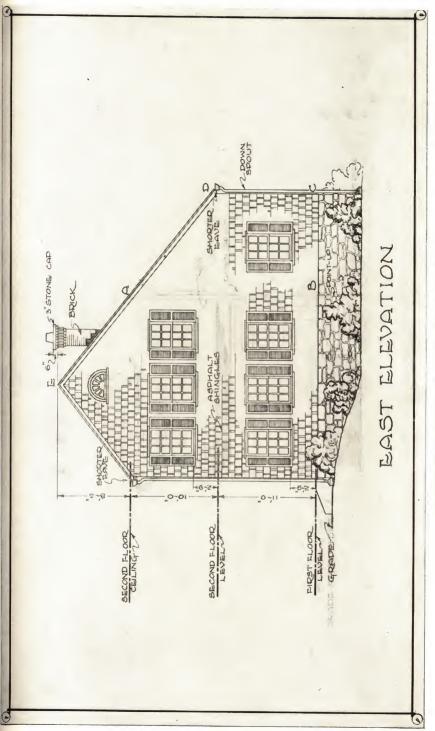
Step 4 in Drawing Remodeling Plans for East Elevation
